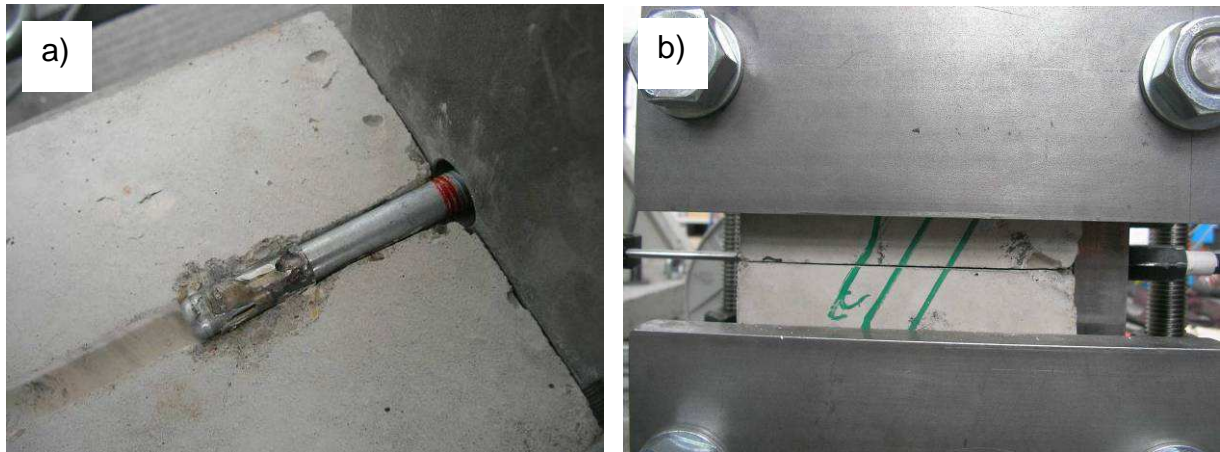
a) Embedding of the anchor with fixed expansion elements; b) Aligning the concrete cubes between upper and lower brace
